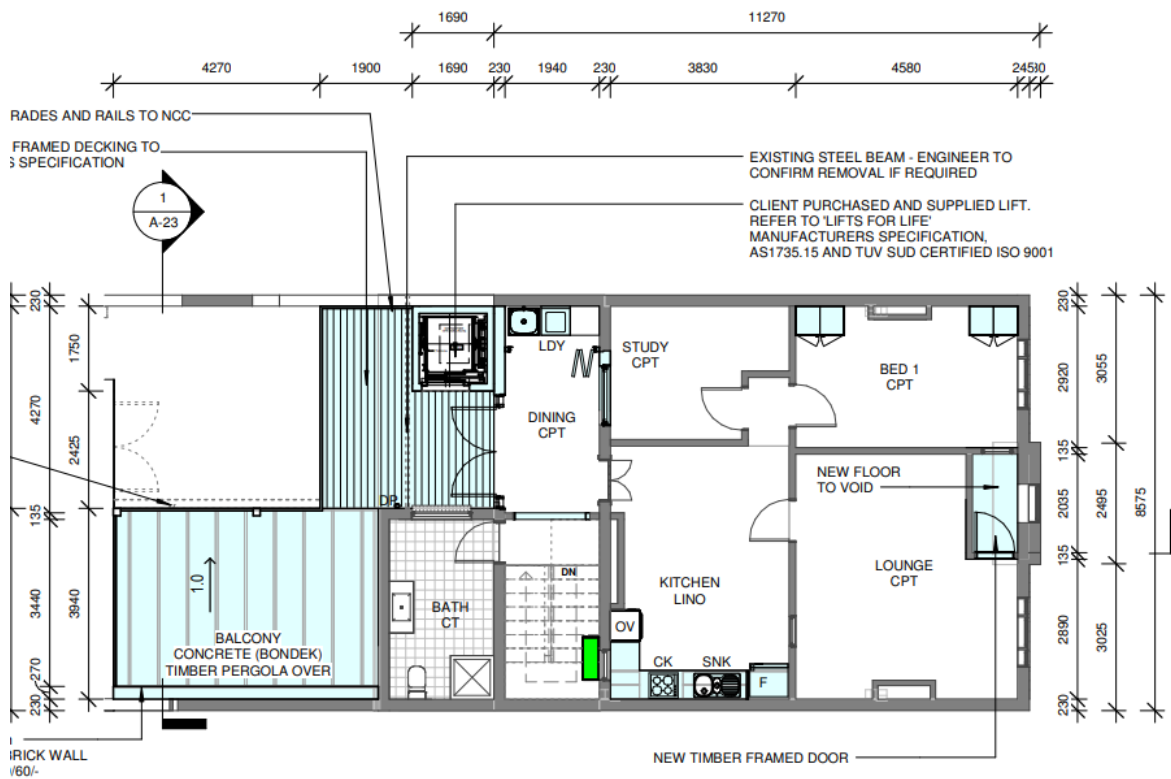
11 Montague Street Proposed first floor plan (Source: TLA)
